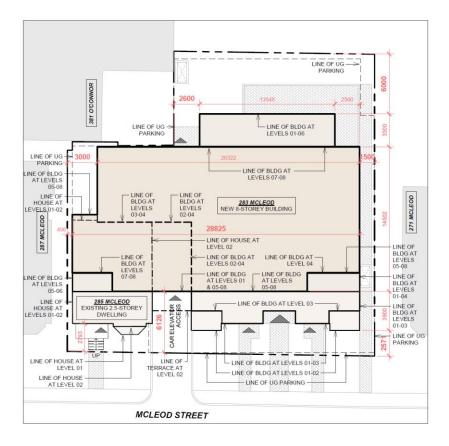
The plan view of the development indicates the scale and massing of the 8-storey building incorporating setbacks, step backs and architectural articulation designed to shape the building and reduce the massing of the upper floors. Source: grc Architects 2021.
